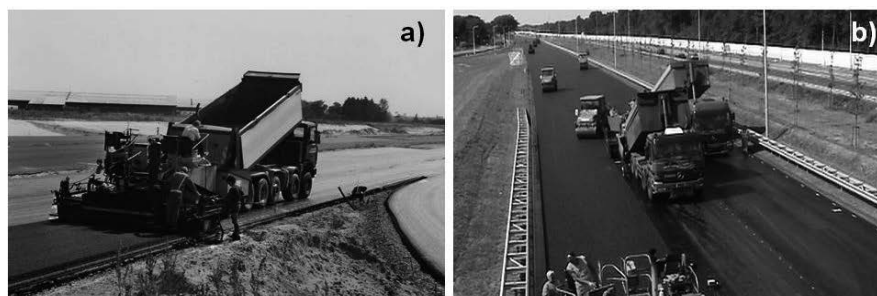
Placing the original porous asphalt course (1997): a) one paver, b) three paver set (source: Z. Tokarski)
